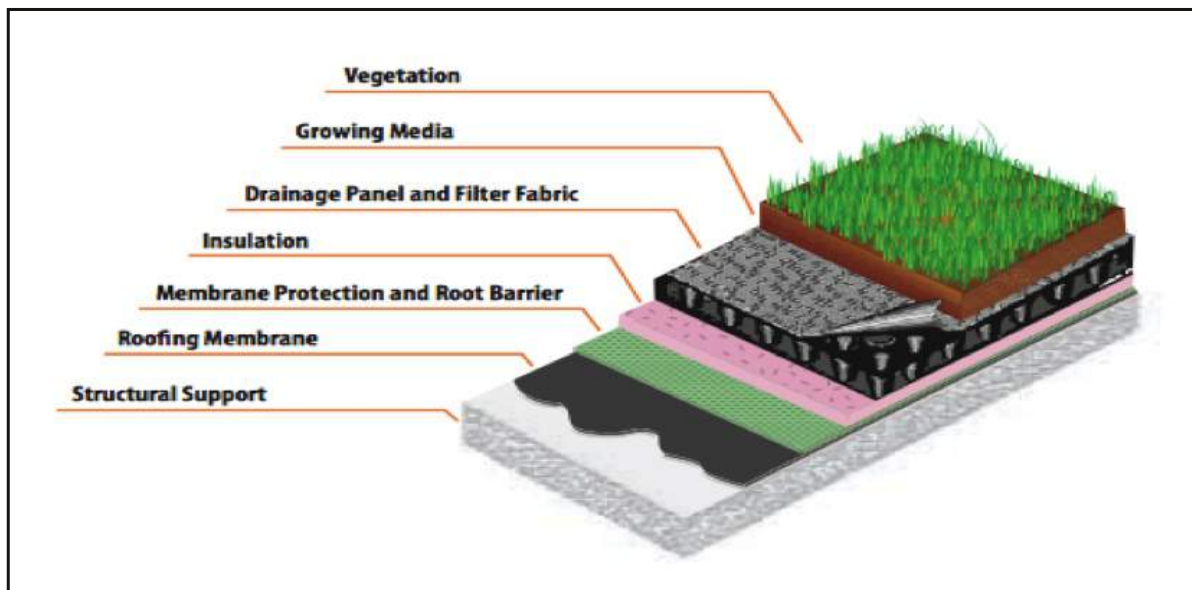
A detailed image of the layers required for green roof installation. Image from Toronto's Green Roof Construction Standard.
